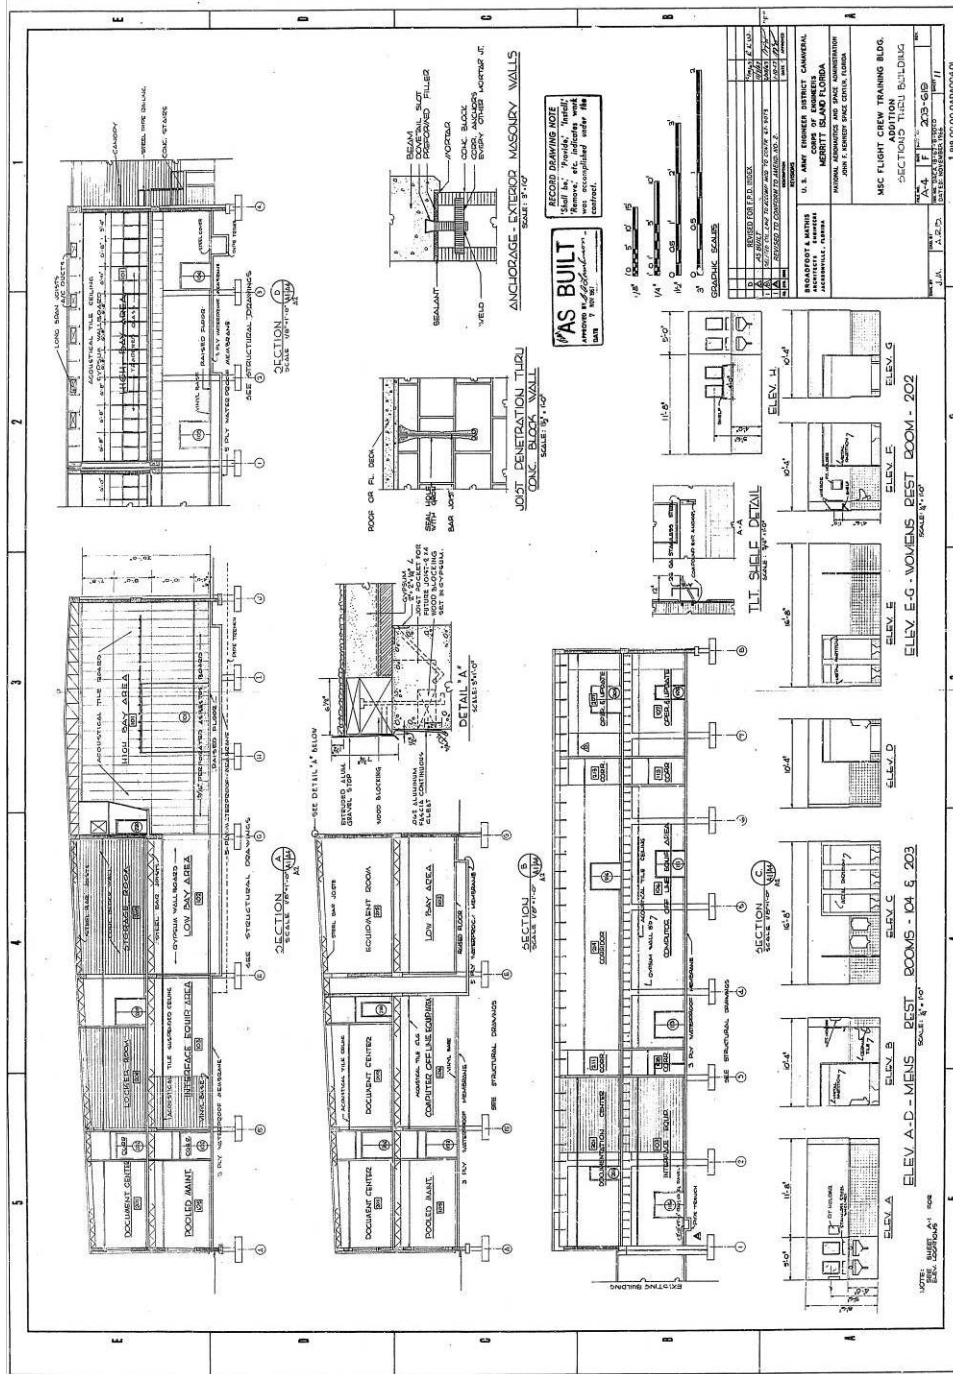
Broadfoot & Mathis, Flight Crew Training Building Addition, Sections Through Building, November 1966, Sheet 8.
